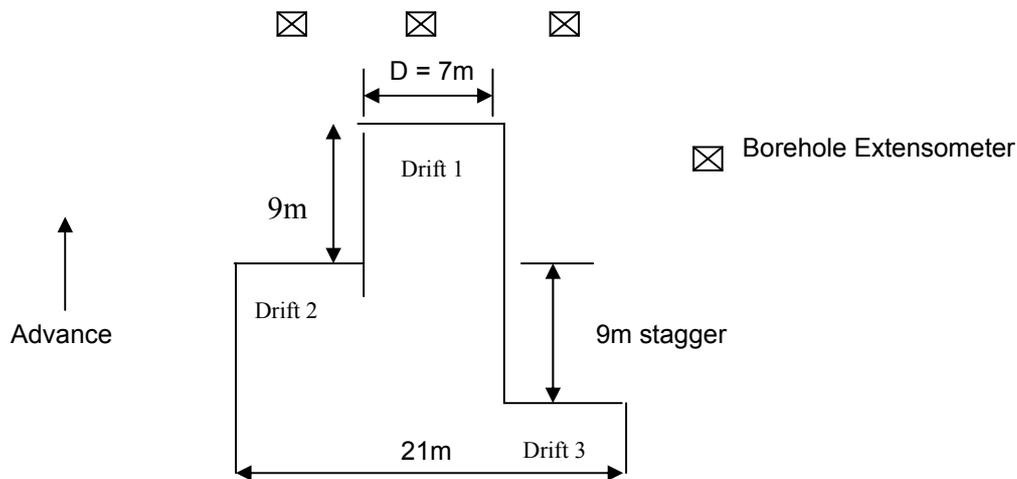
Plan of cavern top heading construction sequence and instrumentation arrangement.
